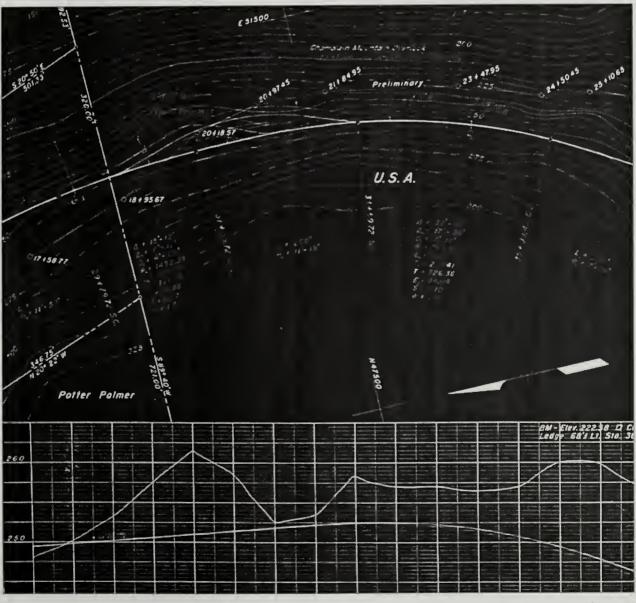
Plan and profile of the Champlain Mountain pullout, Bureau of Public Roads Project 4A2, 1956. (U.5. Department of Commerce, Bureau of Public Roads, Project 4A2, 5heet 6 of 64, April 1956)
